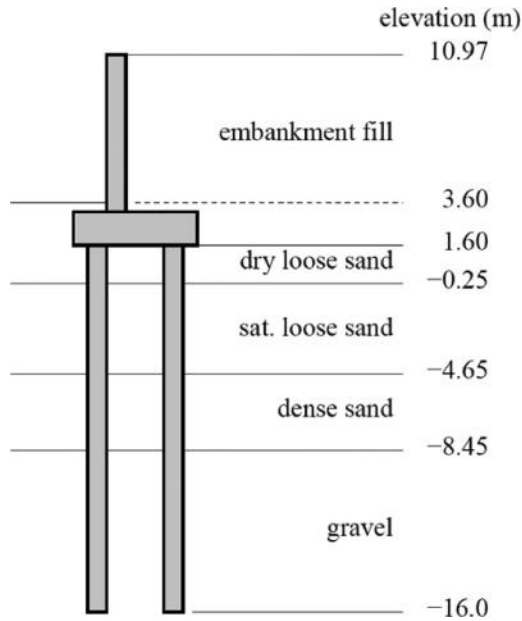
Layout of idealized soil profile near the southwest bridge abutment.
